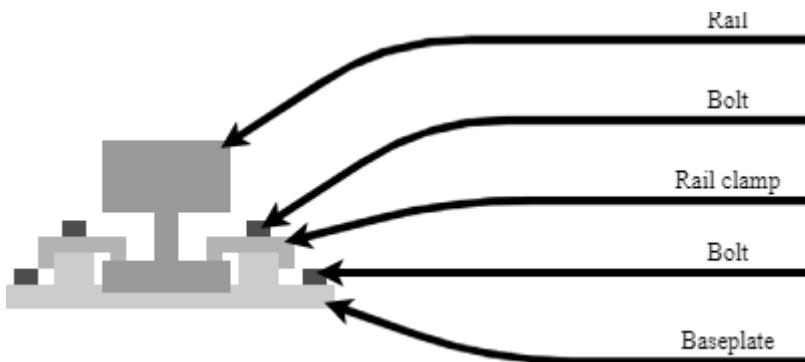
Details of fastening system Hoorn-Medemblik tracks.
